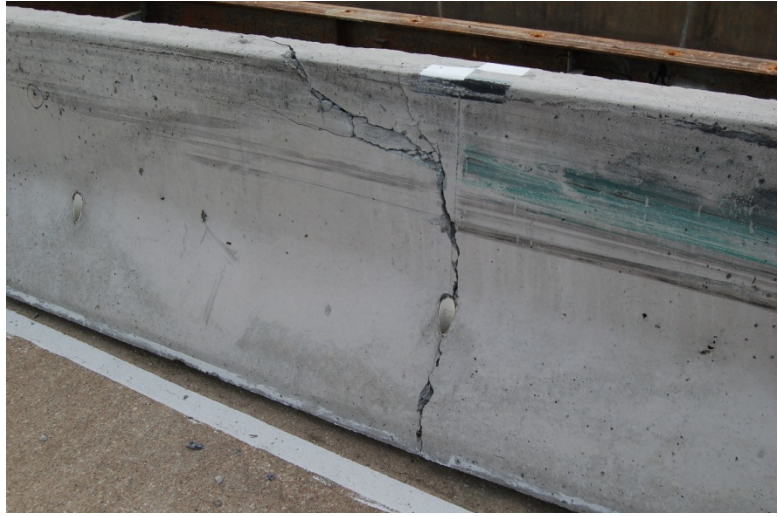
Barrier No. 5 Damage, Test No. NYTCB-5
